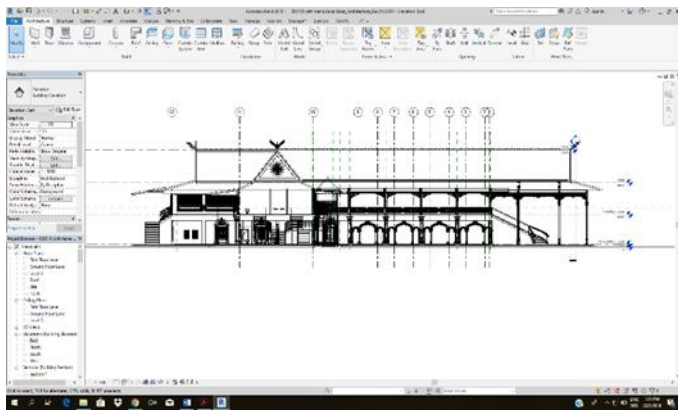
Building layout converted from point clouds to BIM using Revit in 3D view (Authors, 2019)
